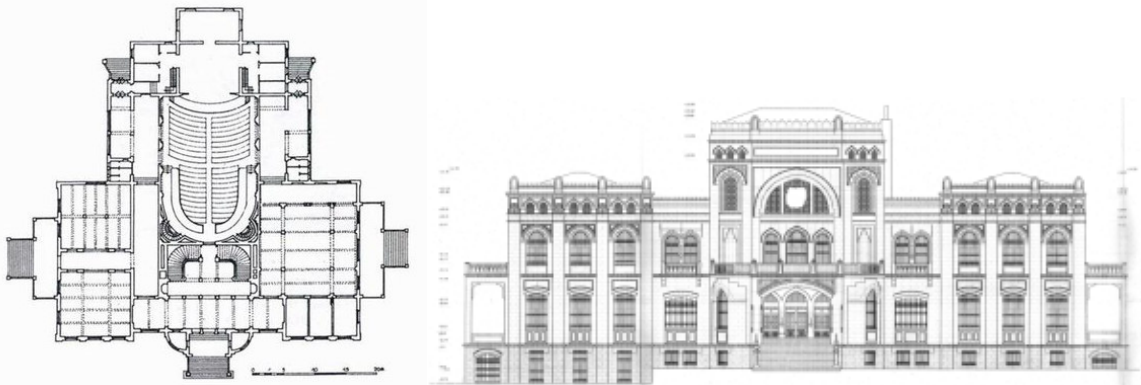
Ankara Turkish Hearth plan (Aslanoğlu, 1980), and the west facade (Bozdağ, 2013)
